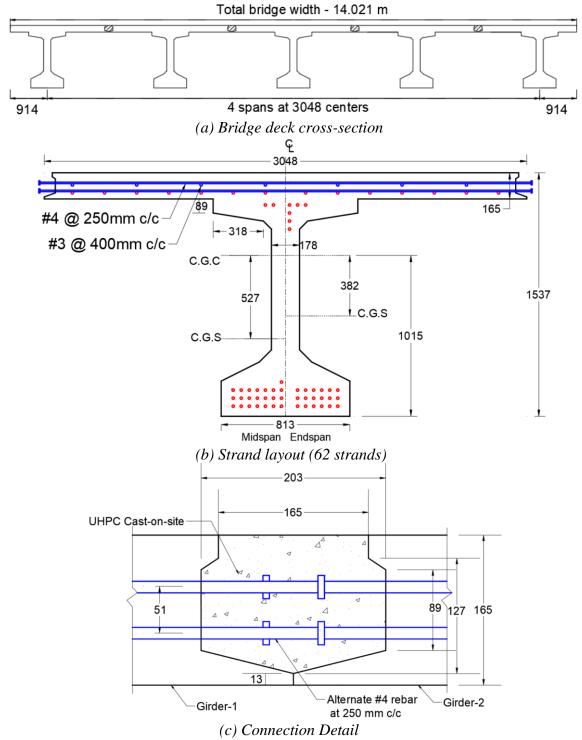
Strand layout and connection detail for Design 6: 5-Tx54-UHPC-Girders with 6.5-inch wide flange
